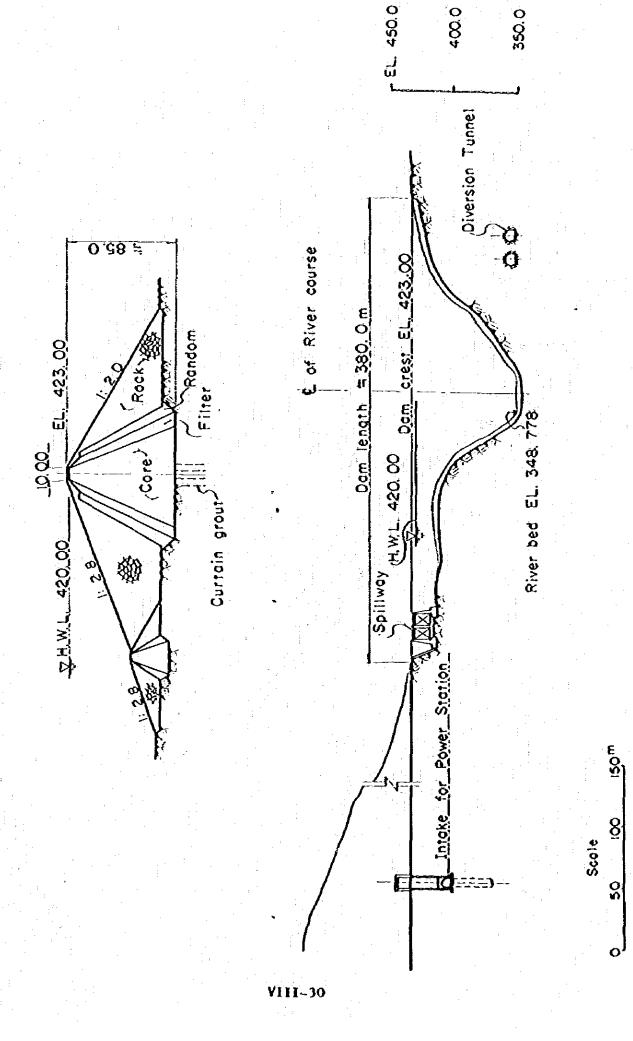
CROSS SECTION AND PROFILE OF KOMERING NO. 1 DAM
